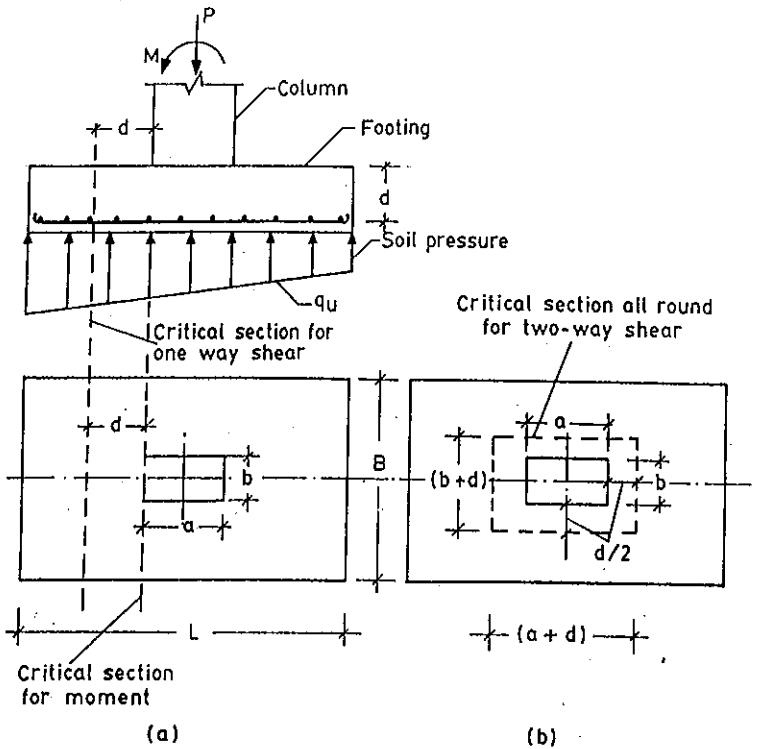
Critical Sections For Moment &amp; Shear in Column Footing
